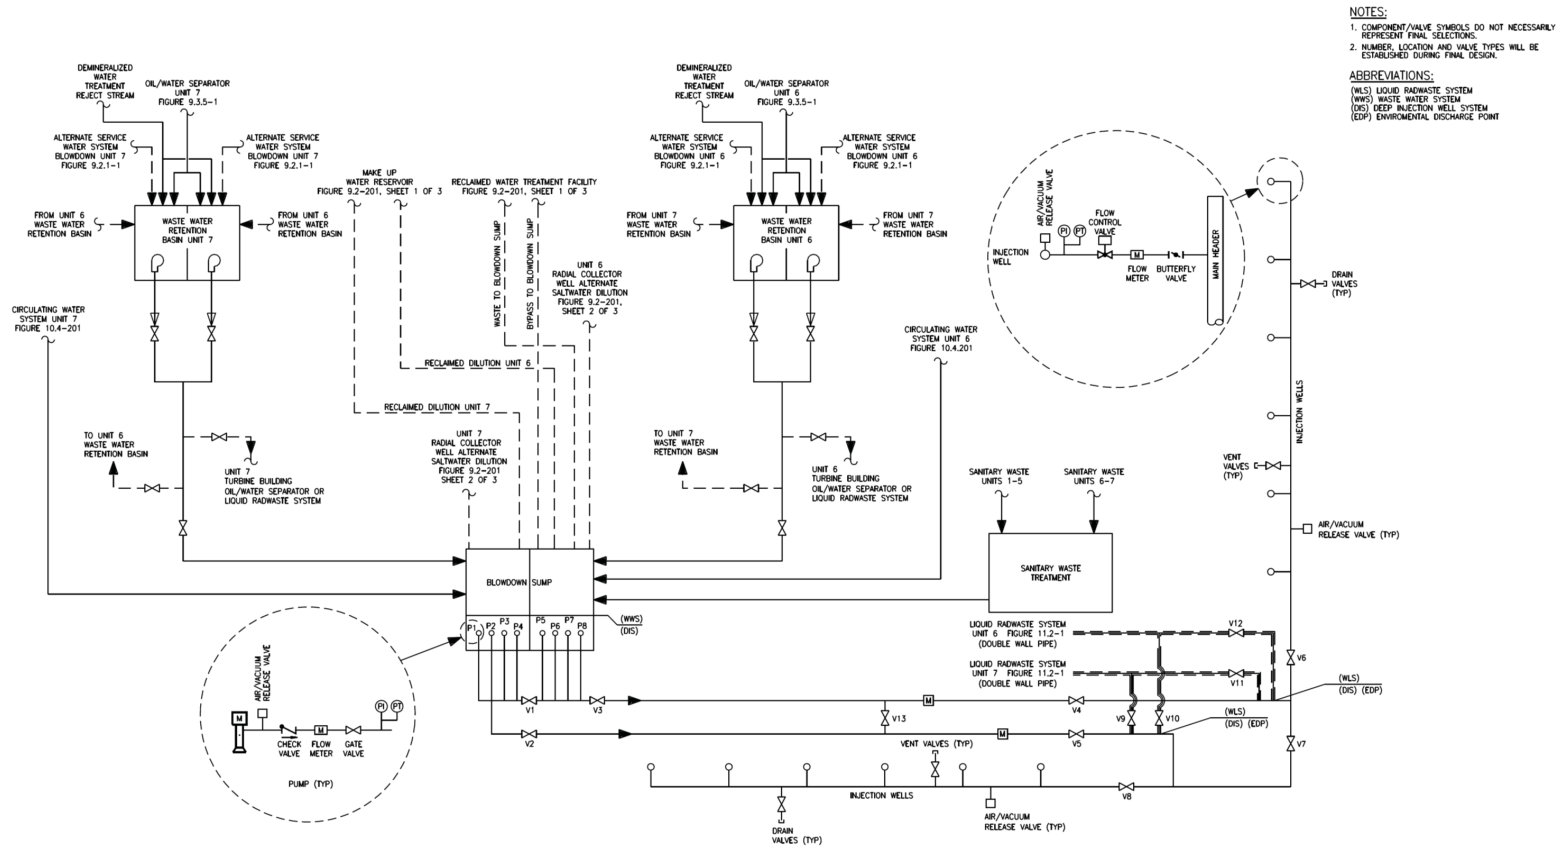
Liquid Waste Stream Collection and Disposal Schematic (Typical)
